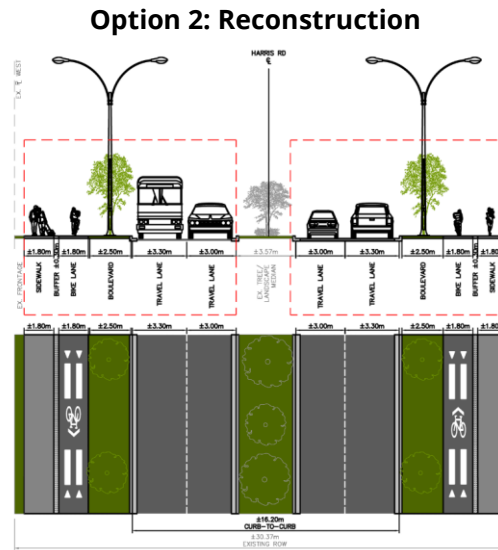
Segment 4-7: Initial Option 2 Reconstruction Cross-Section
